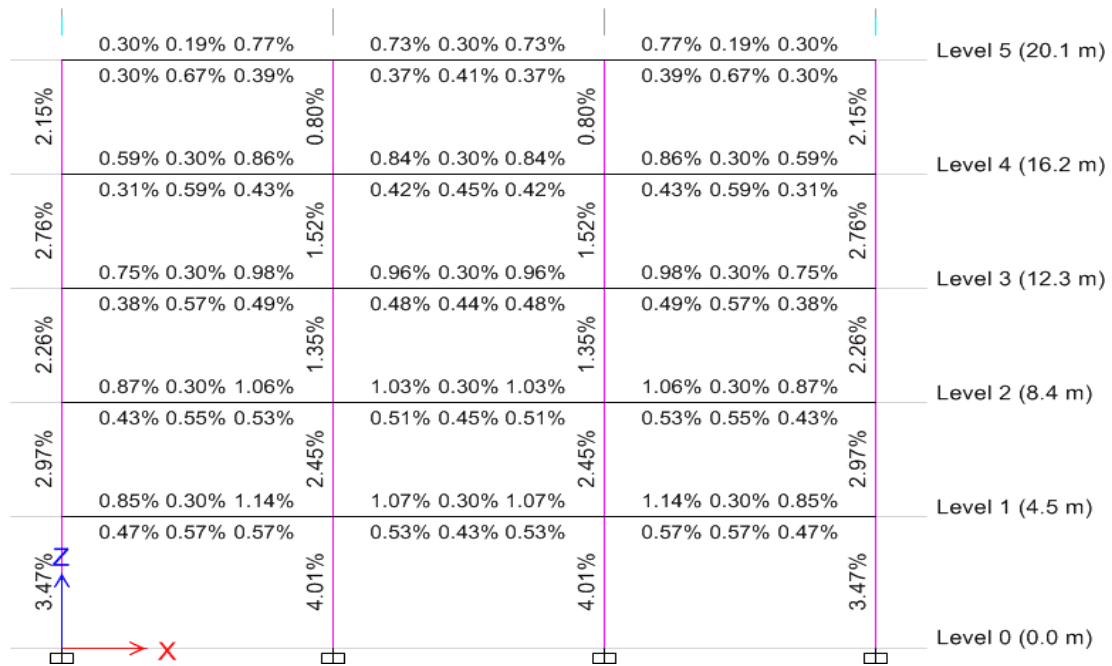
Required longitudinal reinforcement for building ID 2451
